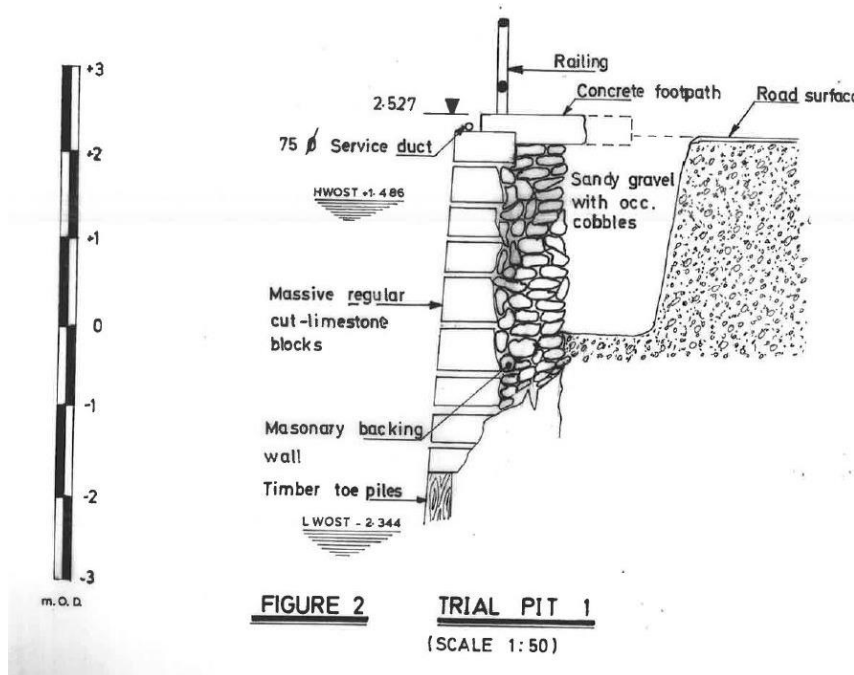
Trial Pit close to Harley Street Bridge Abutment
